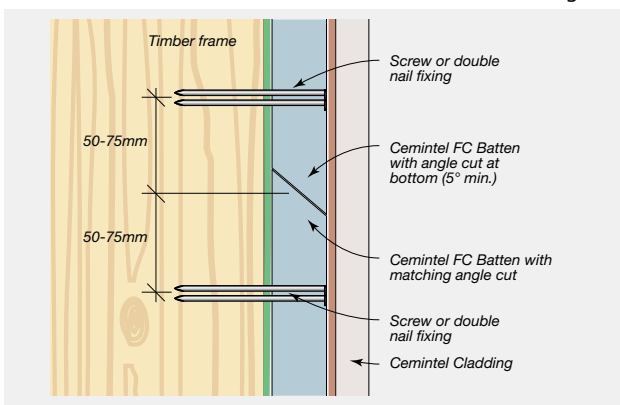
Typical 'Off-stud' Arrangement of Structural Battens
